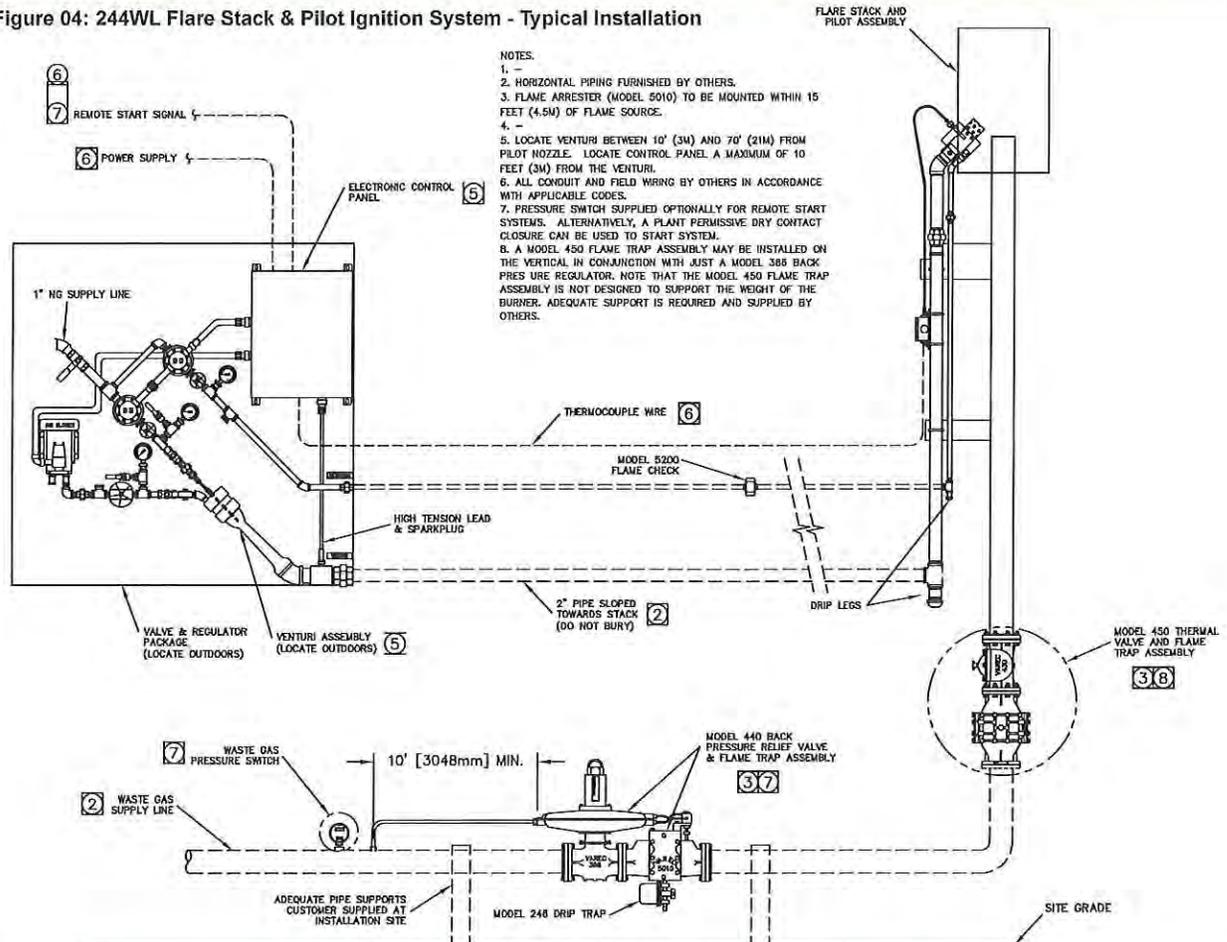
244WL Flare Stack & Pilot Ignition System - Typical Installation
